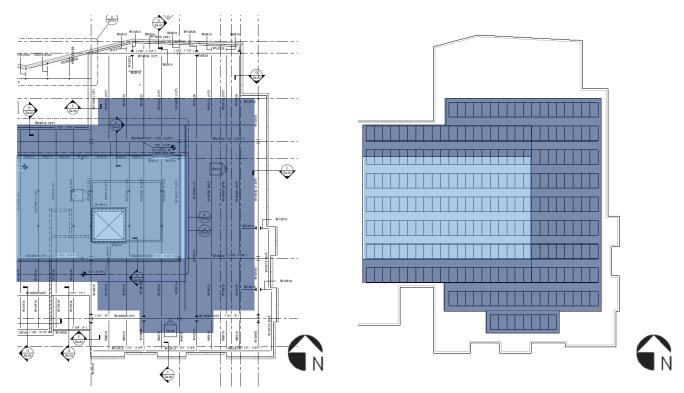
| Roof Structural Plan Composite Deck and Roof Deck
